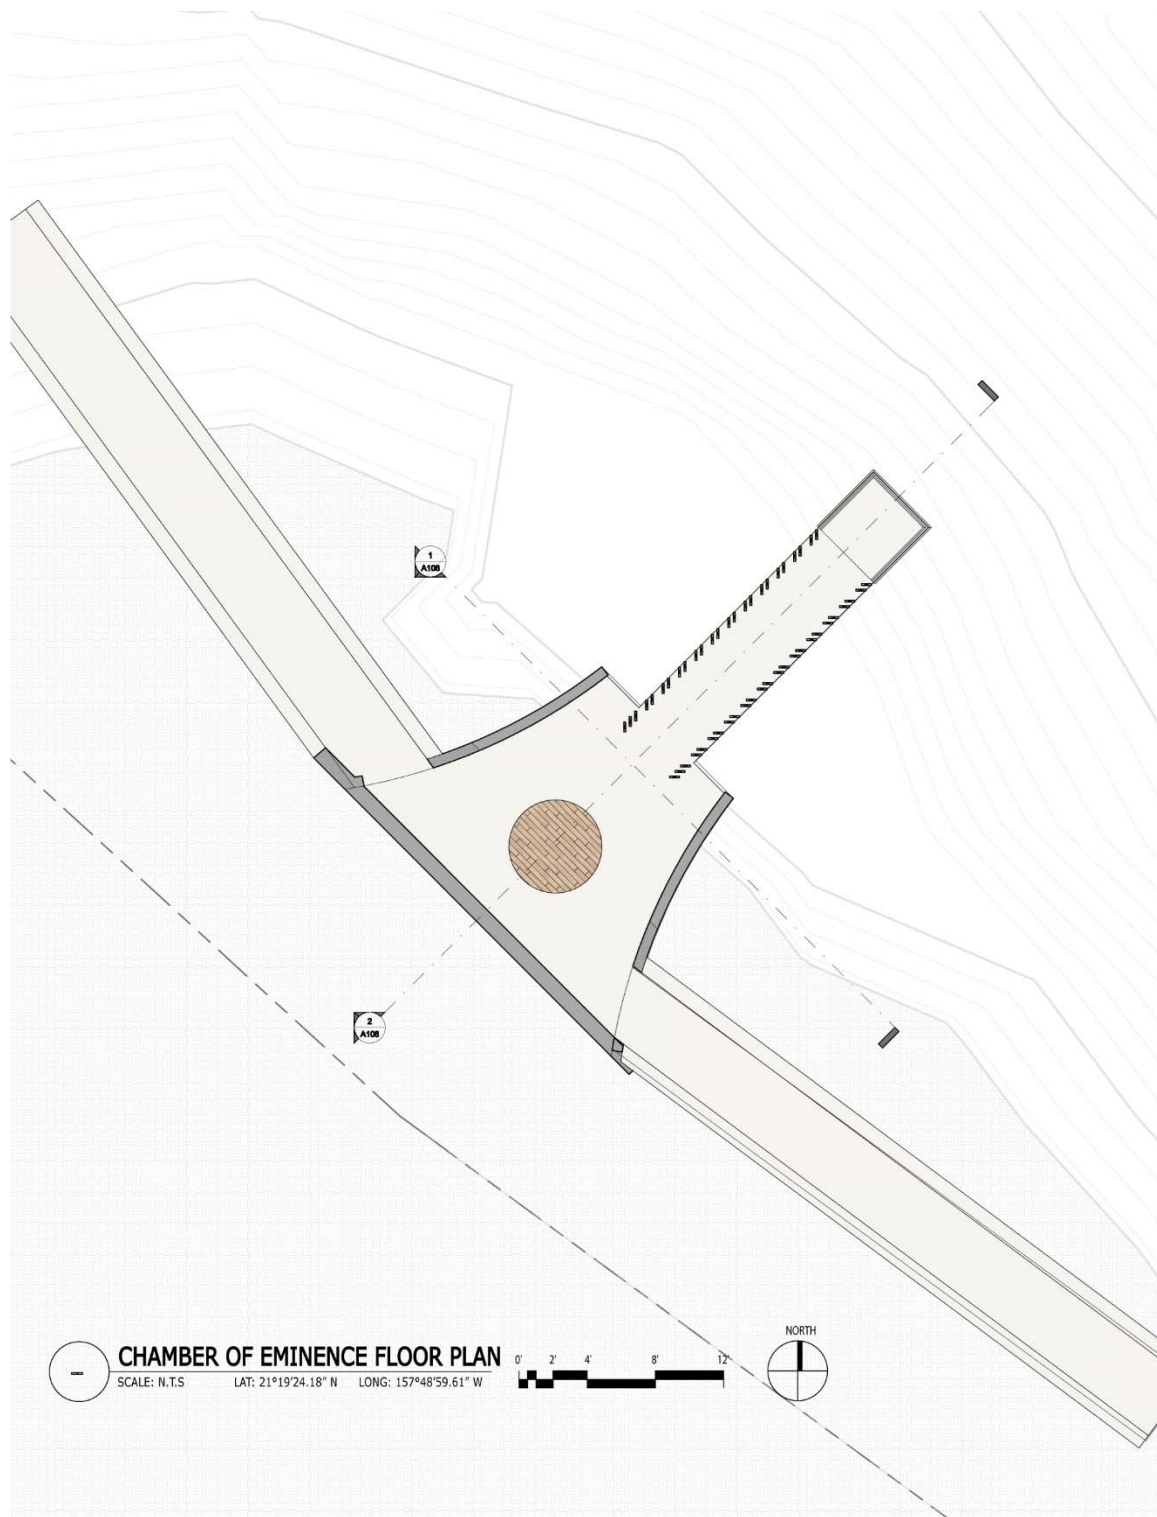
Chamber of Eminence Floor Plan. Made by Author.
